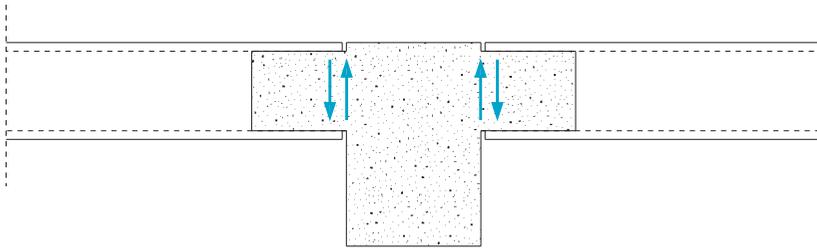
Shear stresses in the attachment section of concrete nuclei to the beam when shear reinforcement is missing.
